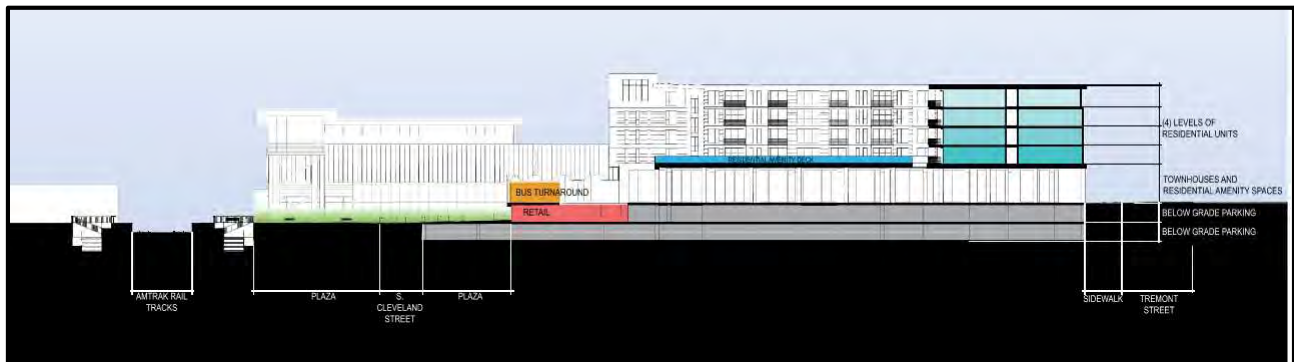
Cross-Section (Cleveland St. on left of page and Tremont St. on right)
